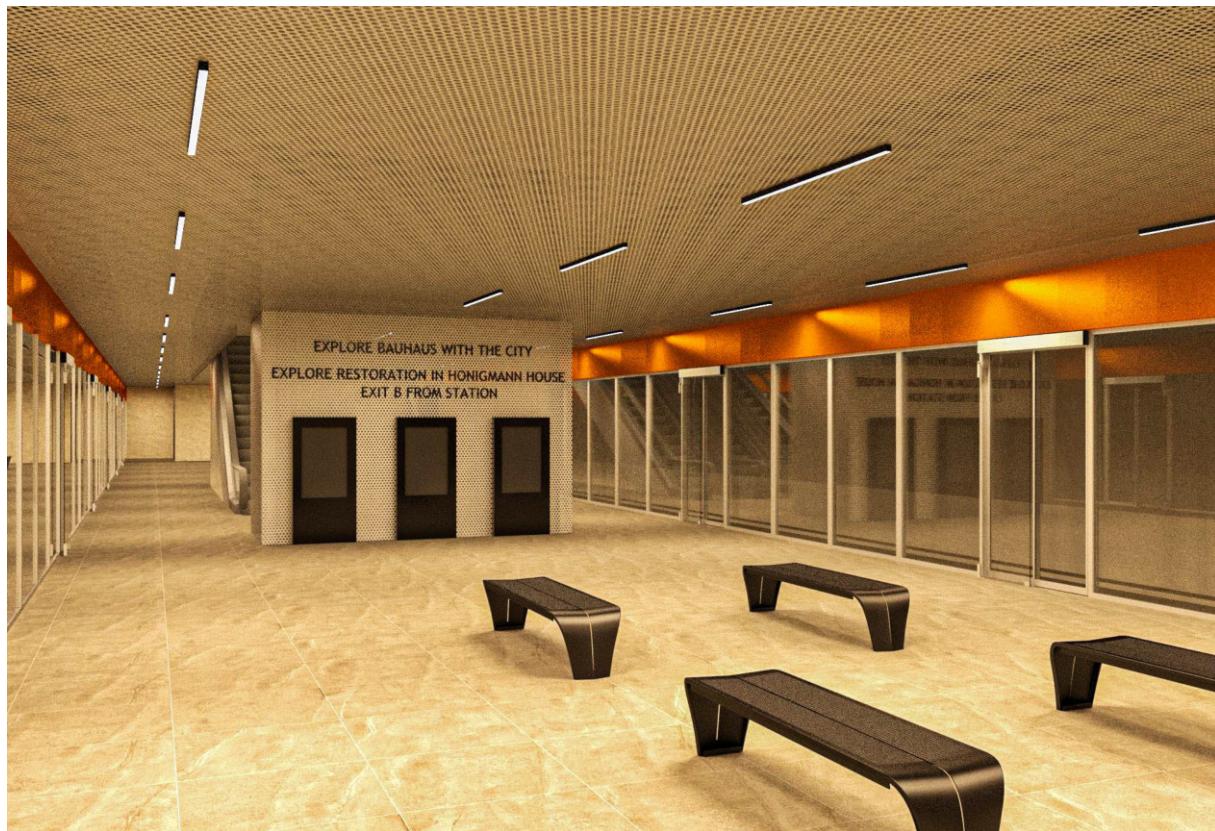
Magen David Metro Station, platforms level, view behing elevators.
